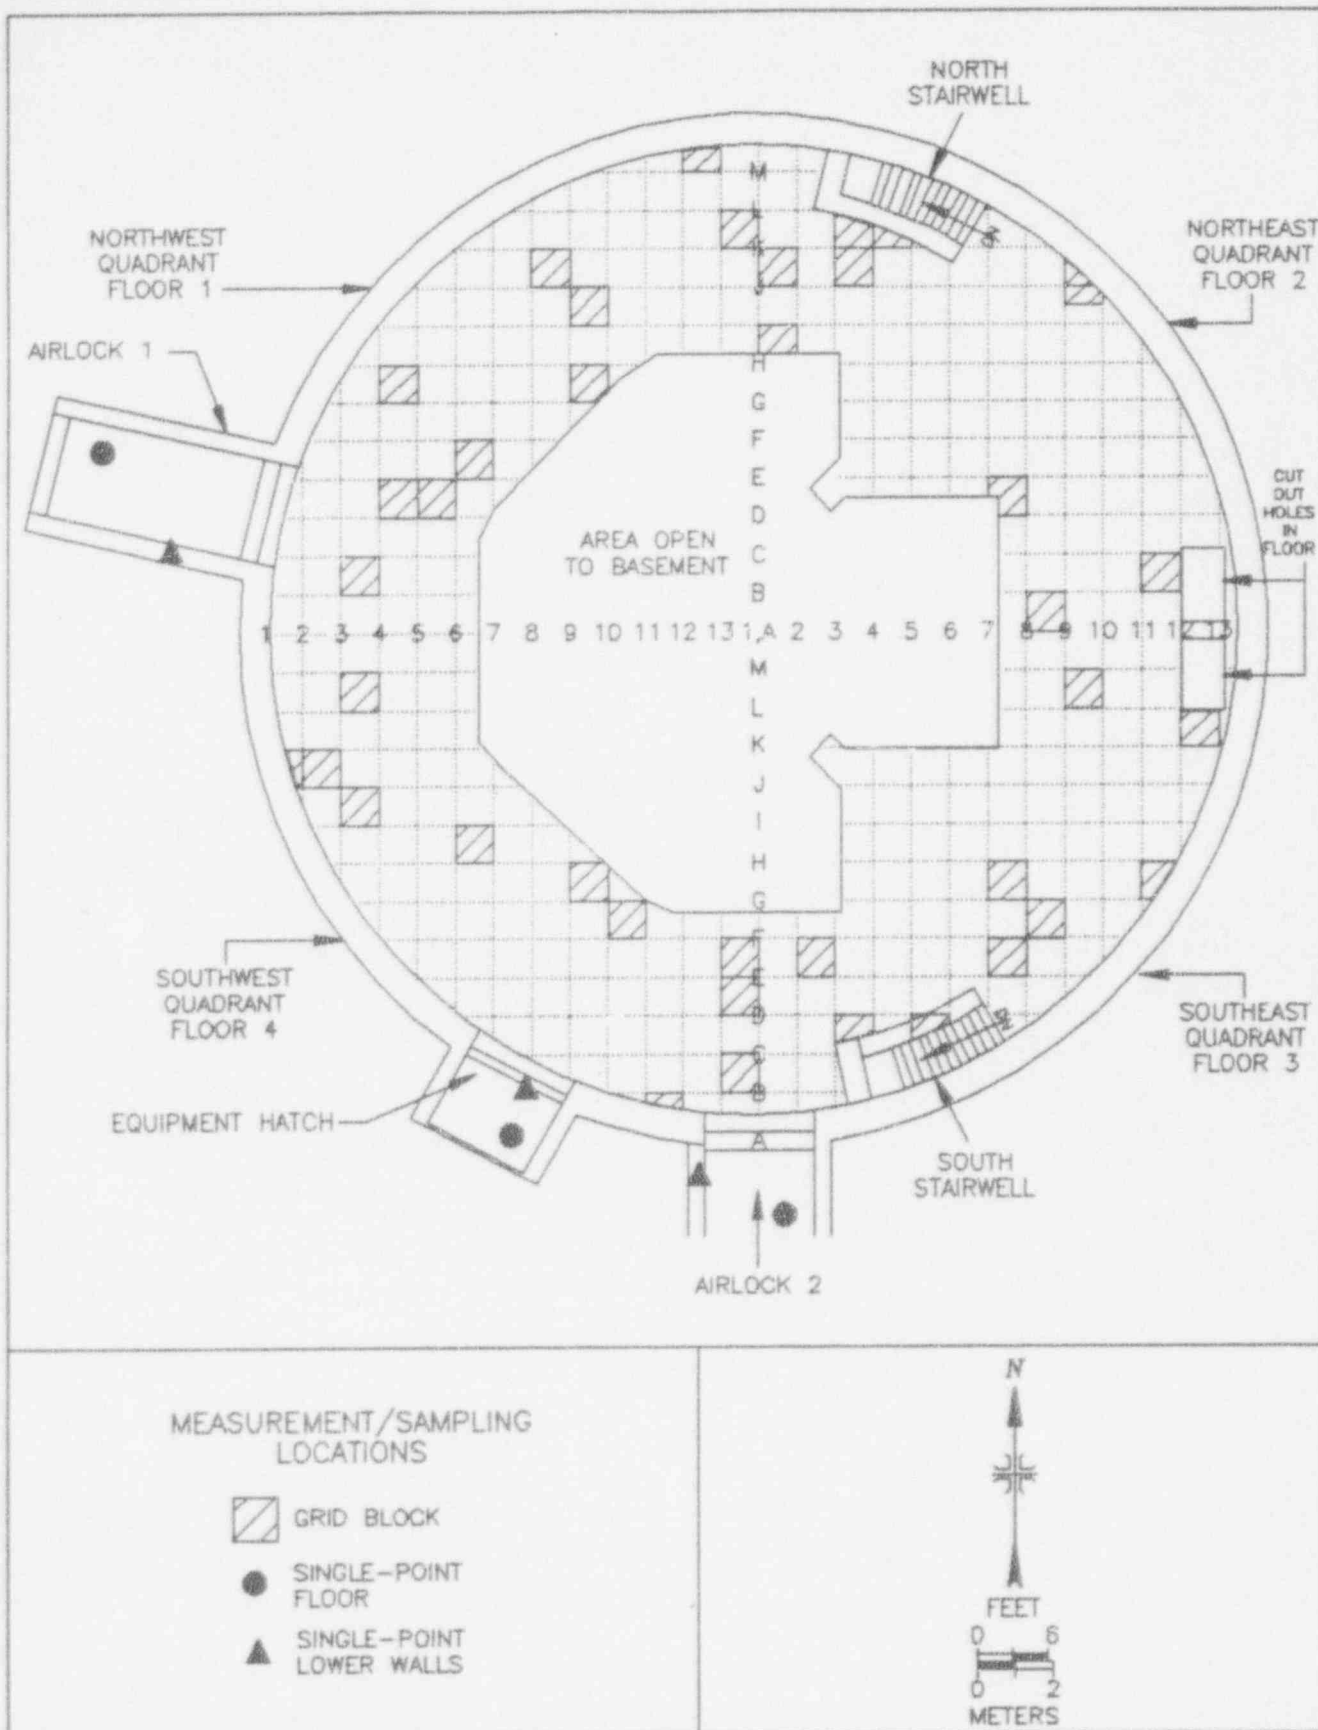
Building 100, Operating Deck Floor - Reference Grid and Measurement and Sampling Locations
